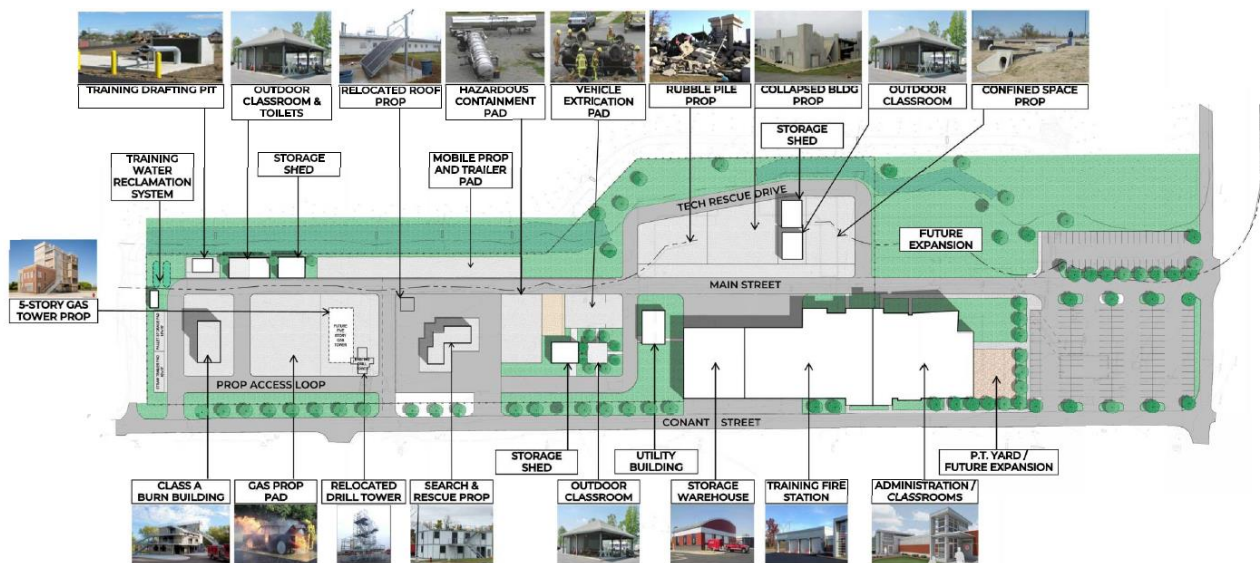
DFS Bridgewater (Southeast) Campus - Master Plan by Dore & Whittier Architects
